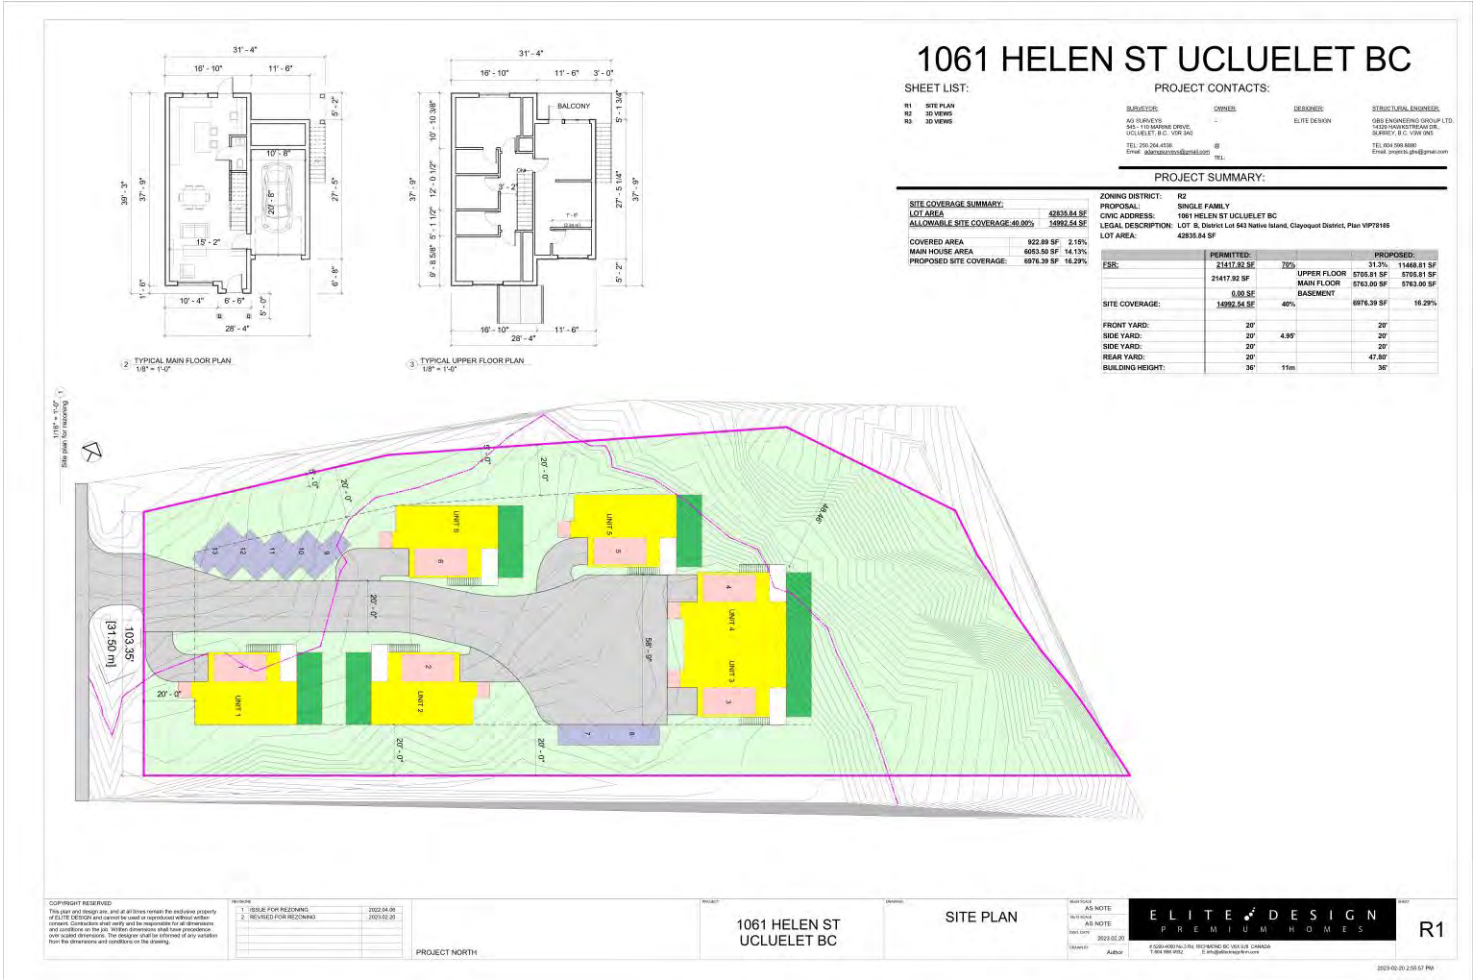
Revised site plan (Jan. 2024) for the proposed construction at 1061 Helen Road. The pink dashed line approximates top-of-bank.
